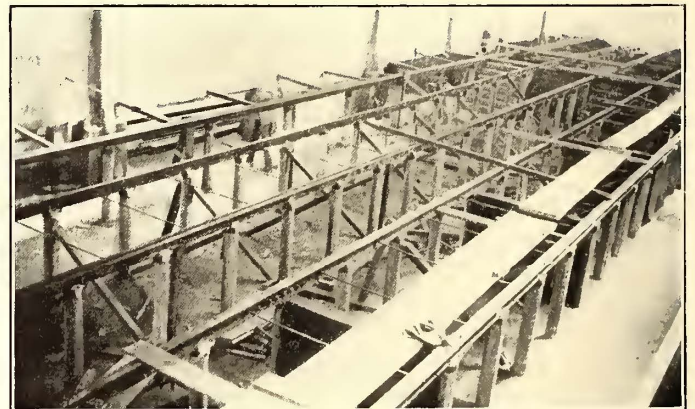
METHOD OF SUPPORTING PIT TRACKS ON REINFORCED CONCRETE POSTS, CONCRETE STEPS AND CASE WALLS BETWEEN PITS
